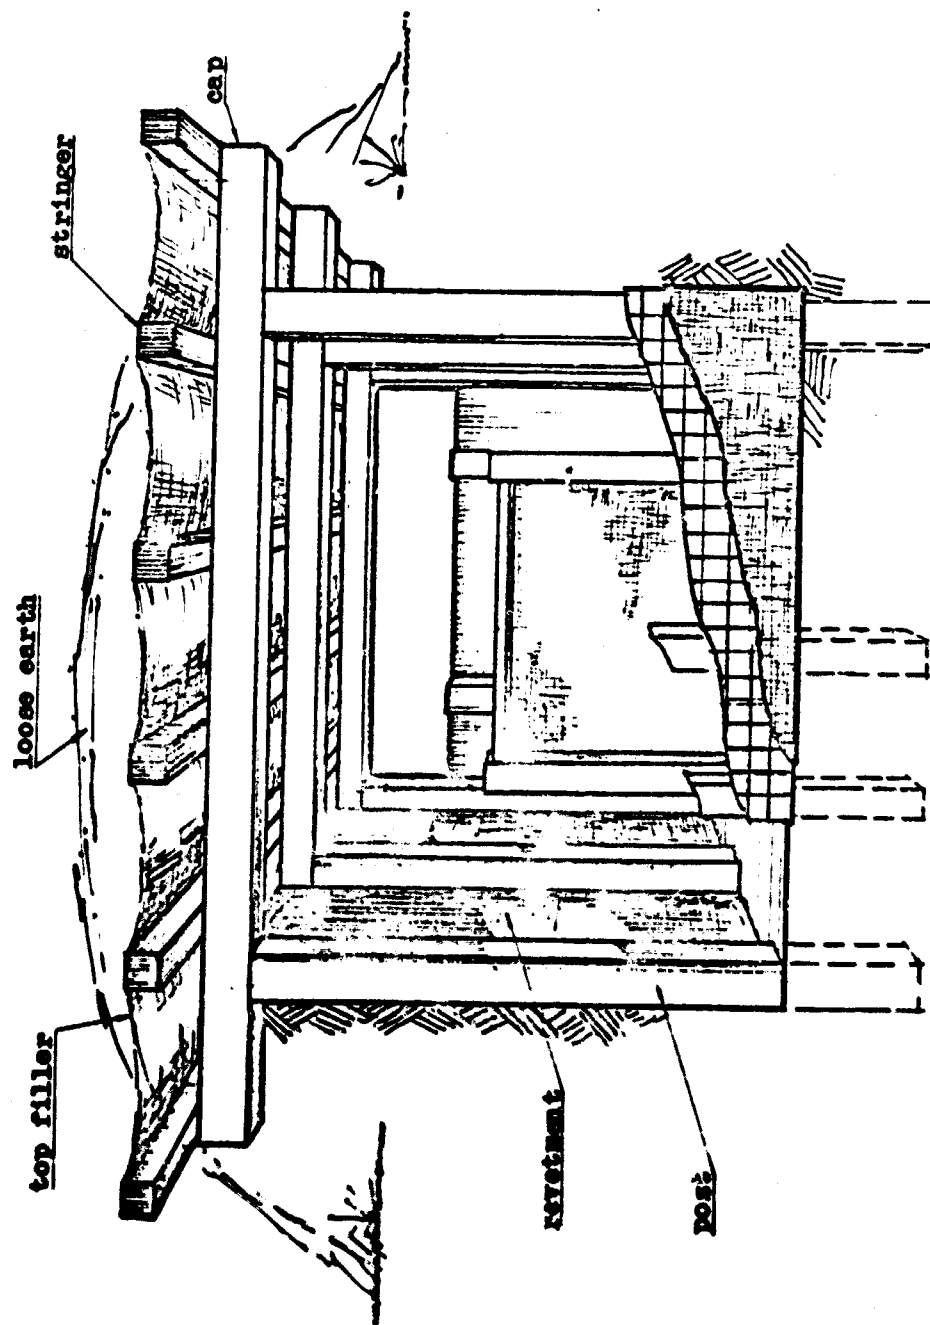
Machine Gun Emplacement with Spaced Stringers and Top Filler
